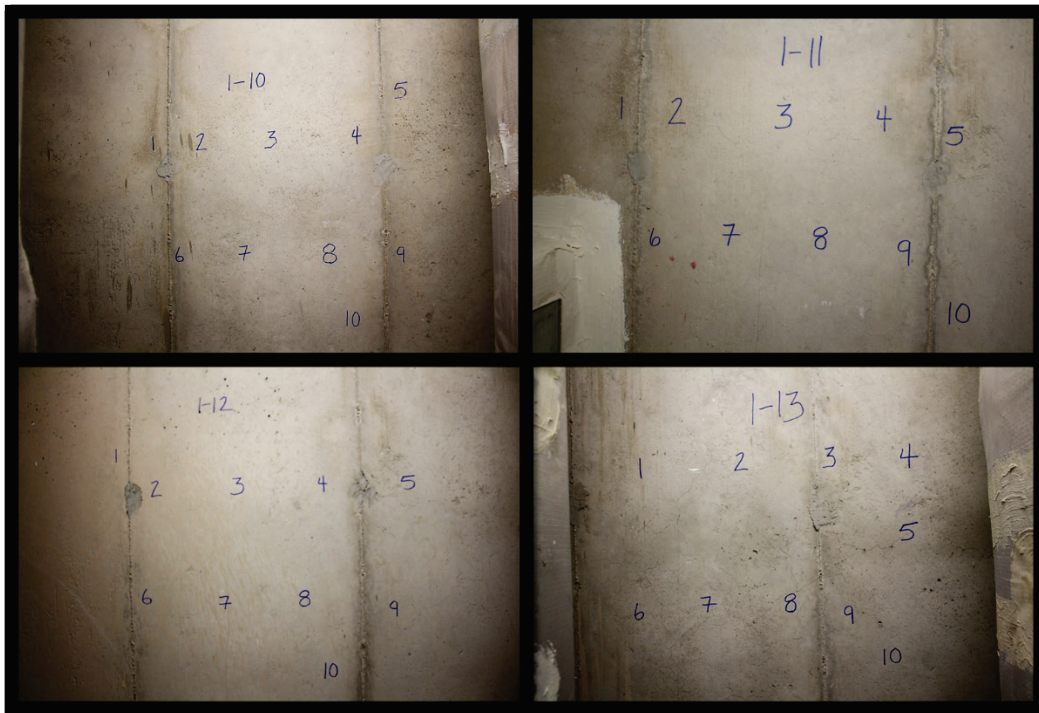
Rebound hammer test locations in Tower 1—Floors 14 and 15.
